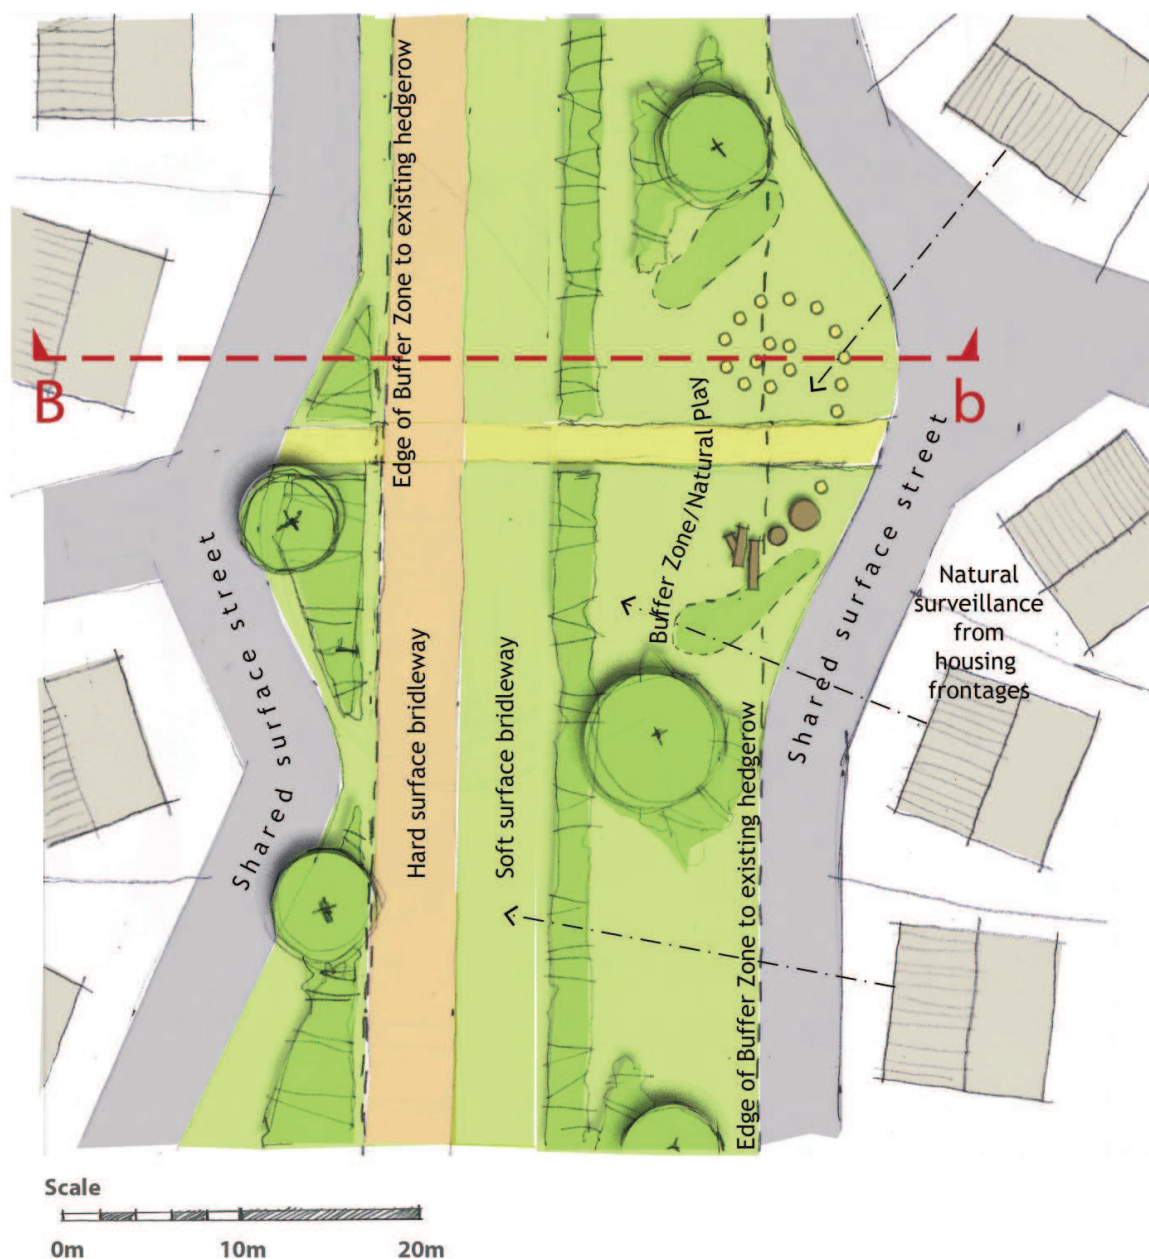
20m (dark corridor) hedgerow buffer design principles - sketch plan and section
